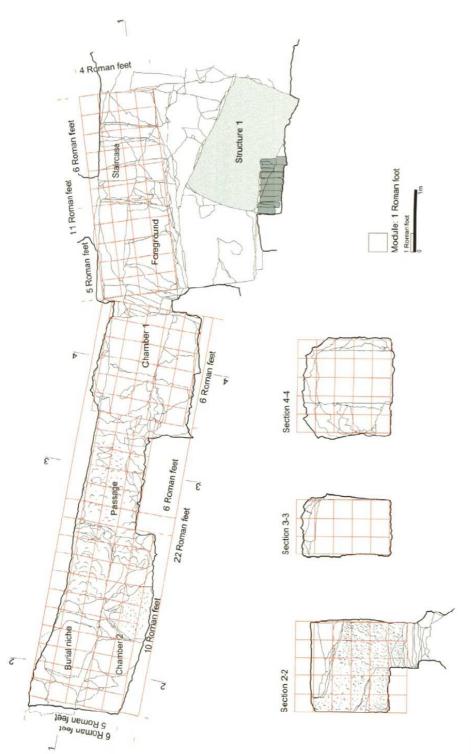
Ground plan and sections of Structure 2 indicating the main proportions and the modular grid of the individual parts (Drawing by ZSOLT VASÁROS)
